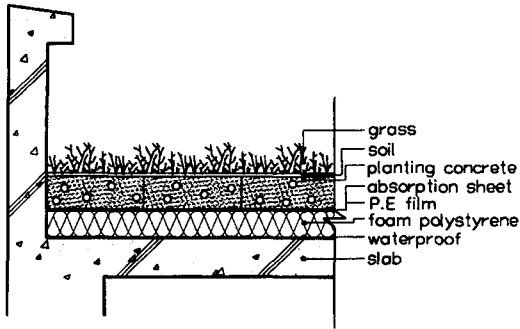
Cross section of roof planting method with planting concrete blocks (new building)
